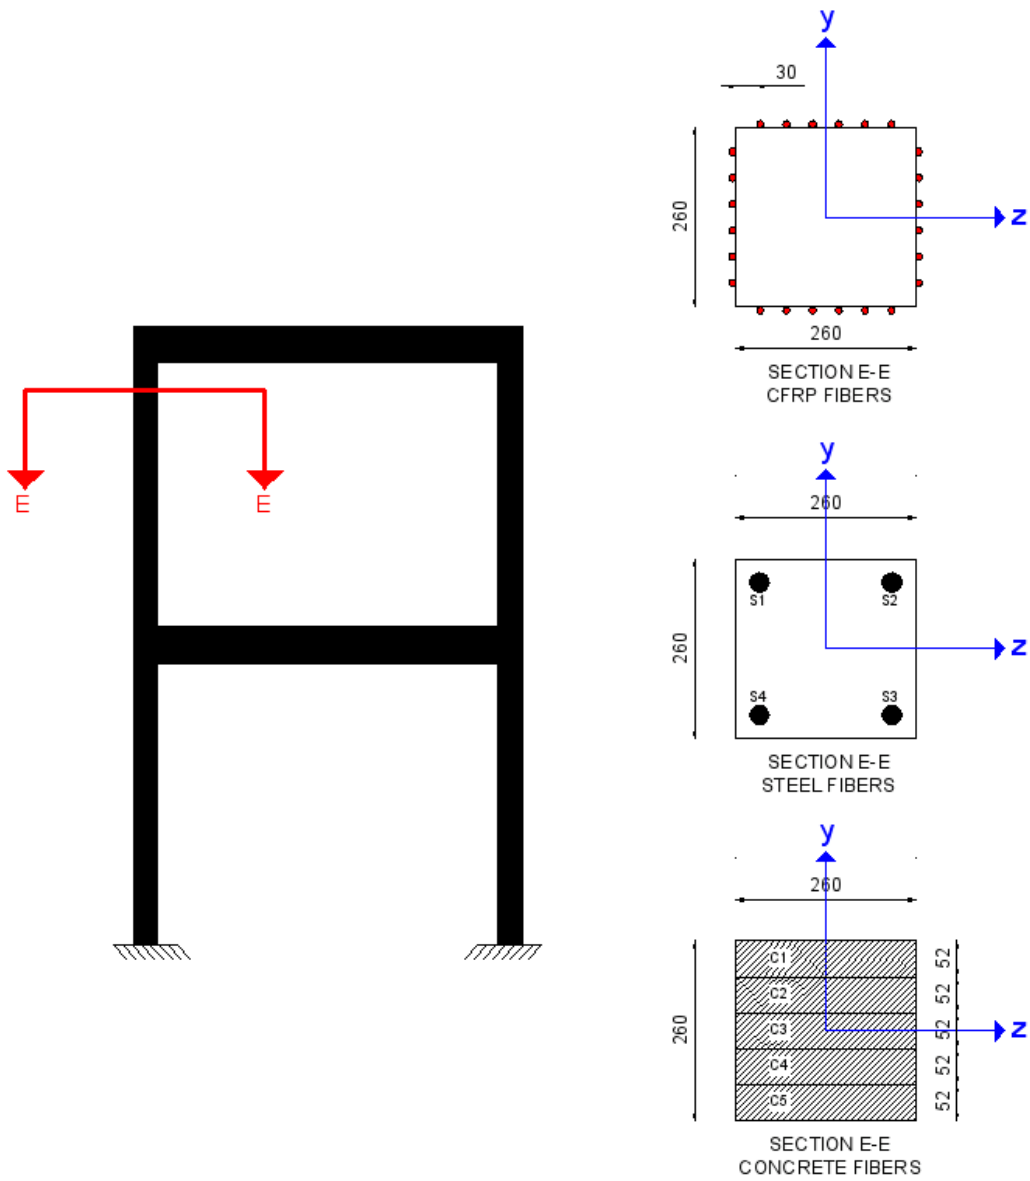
Fibers cross section for 2<sup>nd</sup> floor columns in CFRP retrofitted frame.
